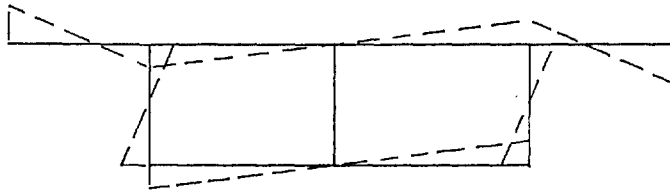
Cross-sectional Deformations in a Typical Twin Cell Box Girder
